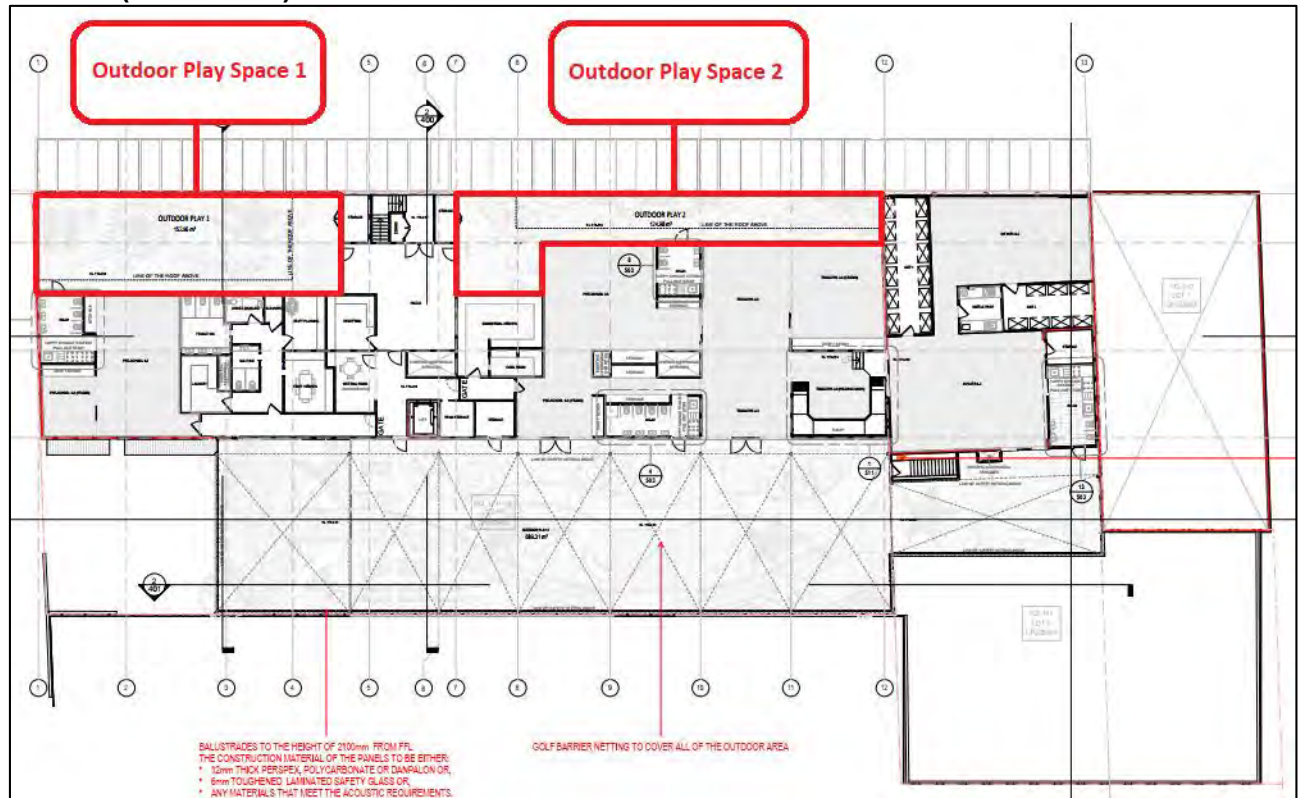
Extract of applicant's submitted first floor plan, detailing the location of the solid 2.1m high acoustic wall to surround the outdoor play spaces, and full height Perspex or glass panels to Outdoor Play Space 1 and 2.
